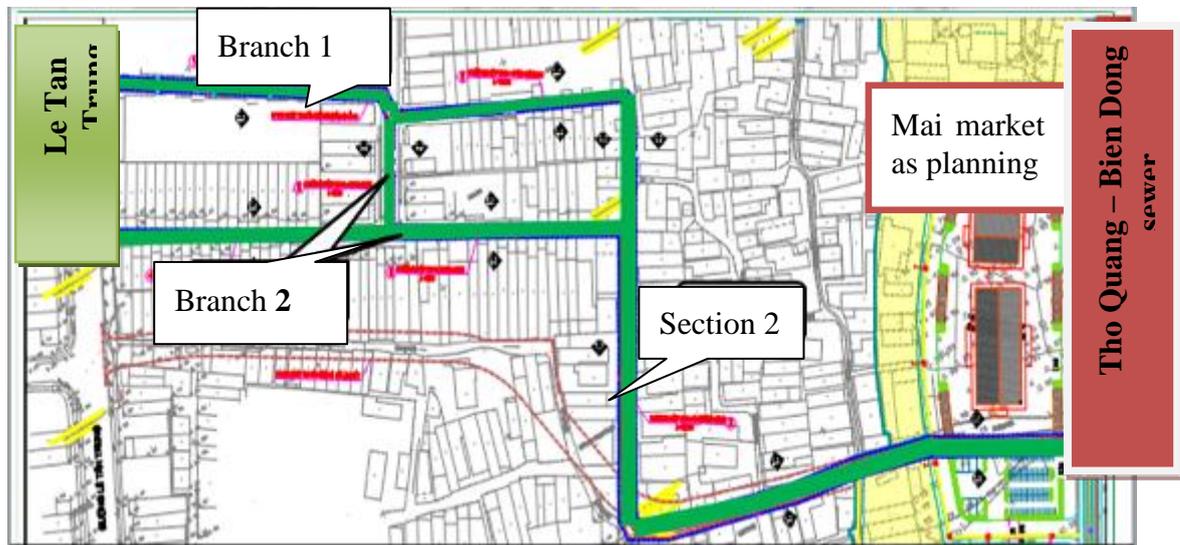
Le Tan Trung sewer line connects with Tho Quang – Bien Dong sewer
